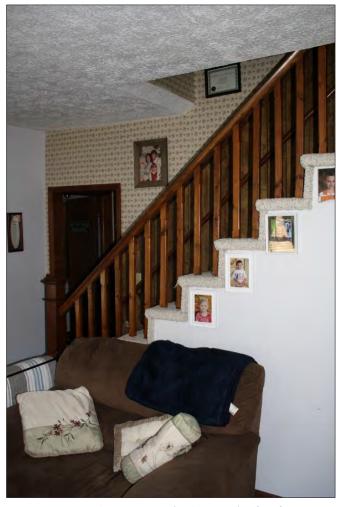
Exposed interior stairs (replacement) in first-floor west room
